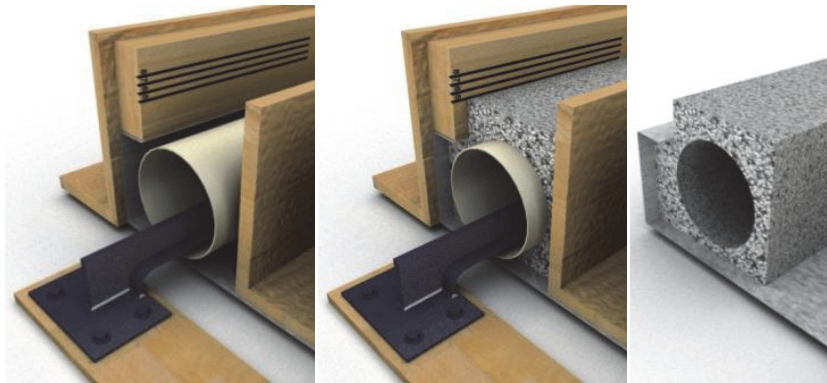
Formwork and additional elements: a) Formwork, b) Lightweight fill, c) prefabricated element, prepared for transportation and erection
